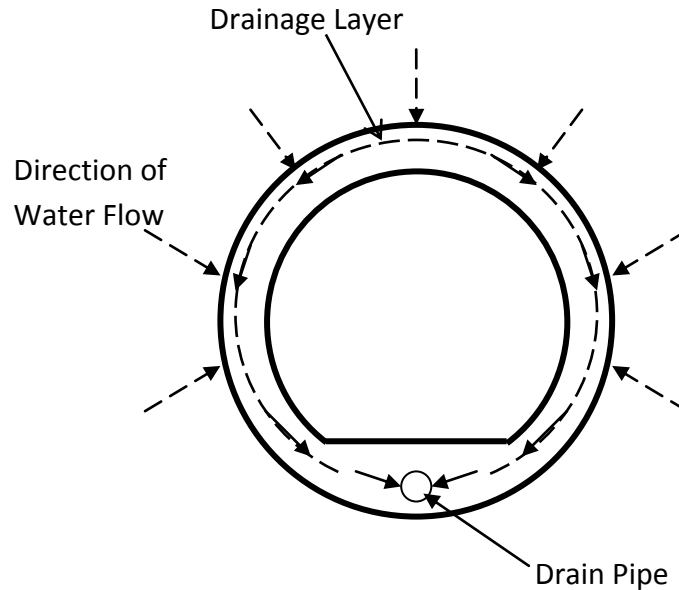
A typical tunnel drainage system (Adapted from Shin et al., 2009)
